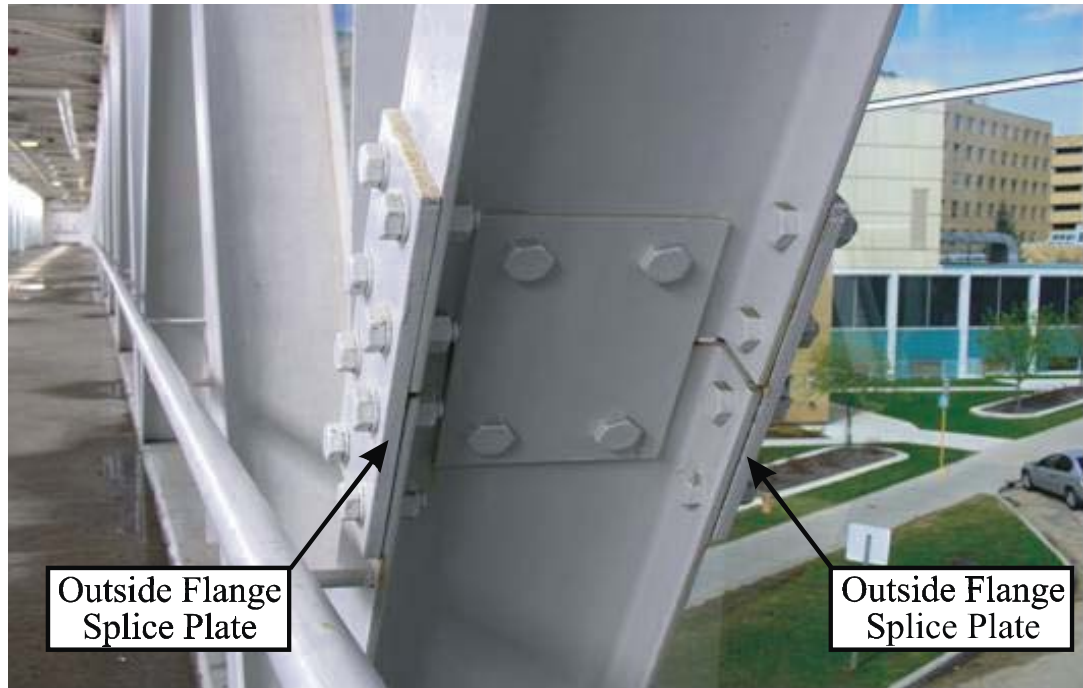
Wide-Flange Connection with Outside Flange Splice Plates Only
